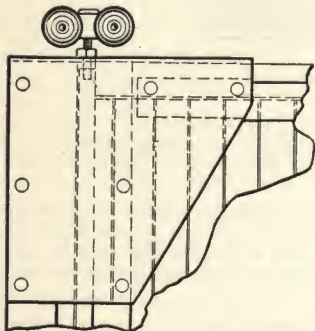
Upper corner of sliding door showing method of attaching door hanger
